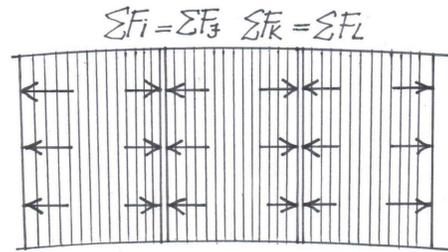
The enlarged part of the arched structure made of multi layered building elements, placed in vertical position; the loading forces are shown
